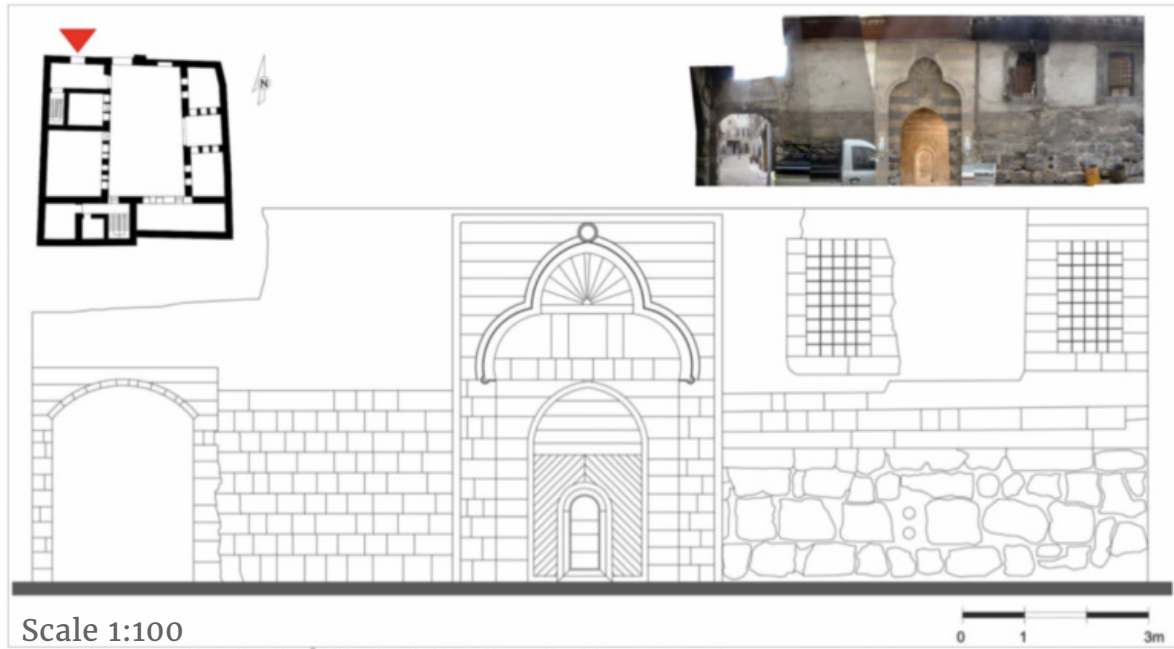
Elevation of a typical courtyard house , Al Aglani House (Fayyad, 2022)
